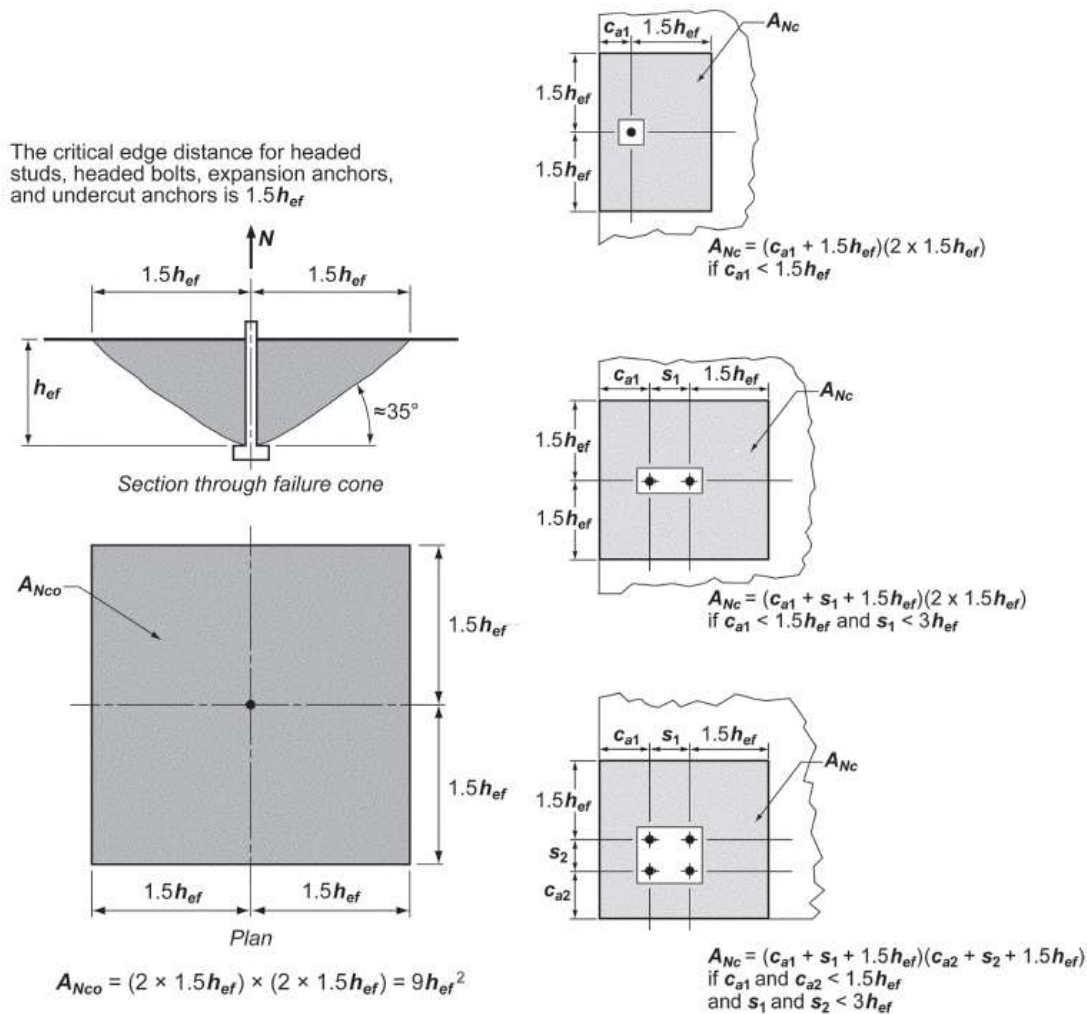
Examples of various concrete breakout failure projected area for single and group anchors (ACI 318, 2014)
